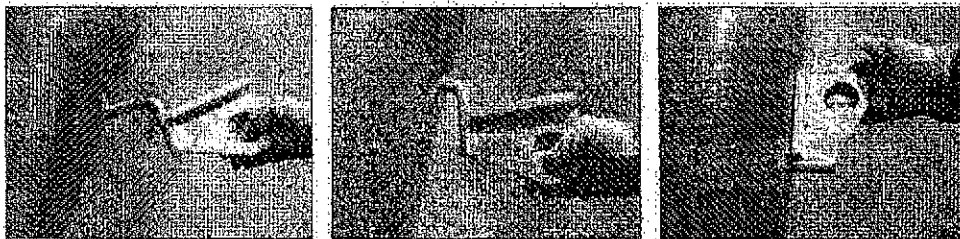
Jacking lug being inserted into pre-drilled jacking lug hole.
